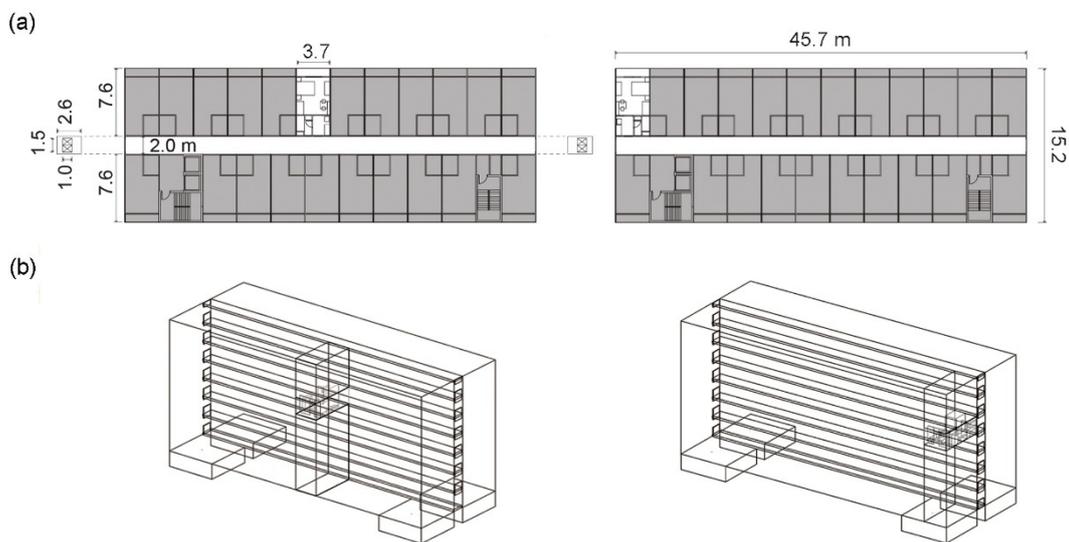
(a) Floor plan of the base case building, and (b) isometric view of the base case building showing the location of the middle unit and corner unit.
